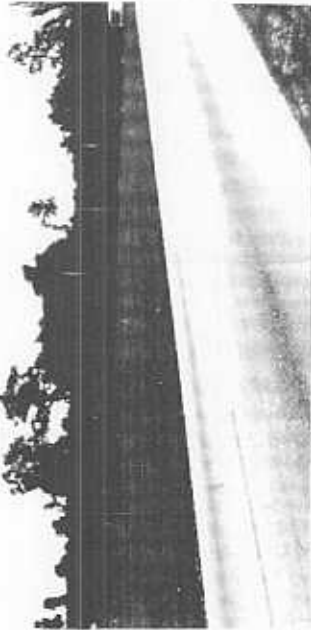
SITE NO. 1. BELLE GLADE FLORIDA
